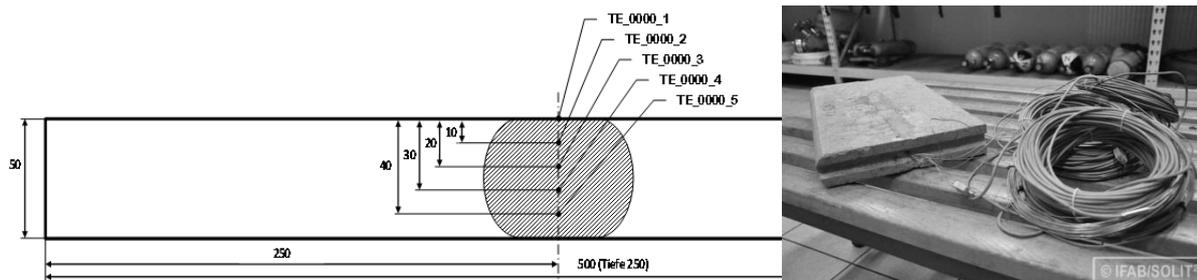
Sketch and photograph of a concrete specimen and assembled material thermocouples
